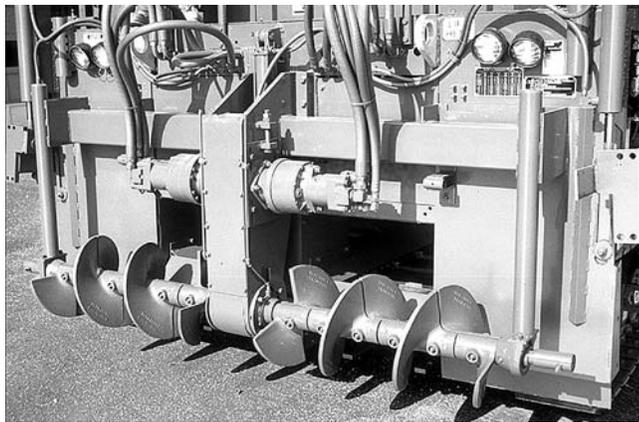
Paver auger with gearhousing at midpoint equipped with reverse paddles.
